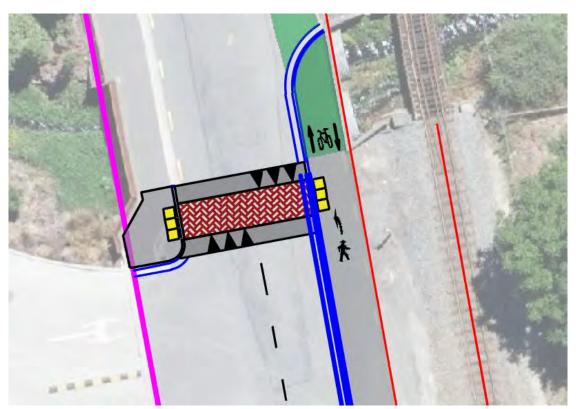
Proposed Raised Safety Platform (pedestrian crossing) north of Pak'nSave (Railway Road)
